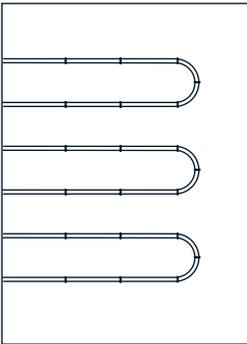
Slab on or below grade – single pour over piping in a sandbed
